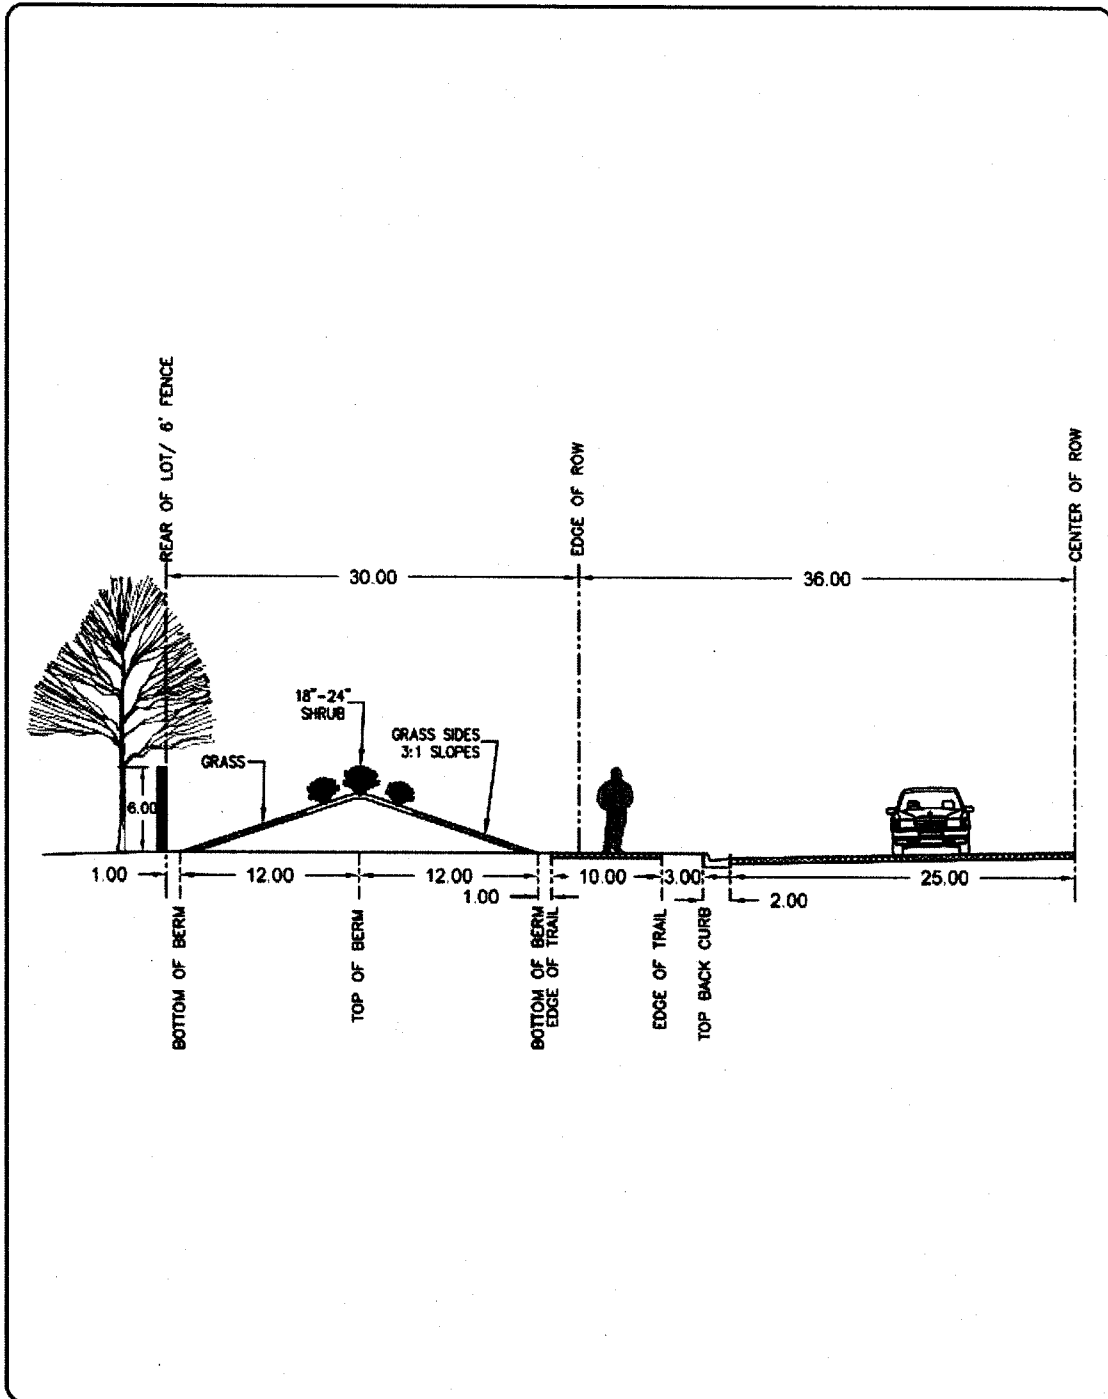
MILL ROAD LANDSCAPED BERM
